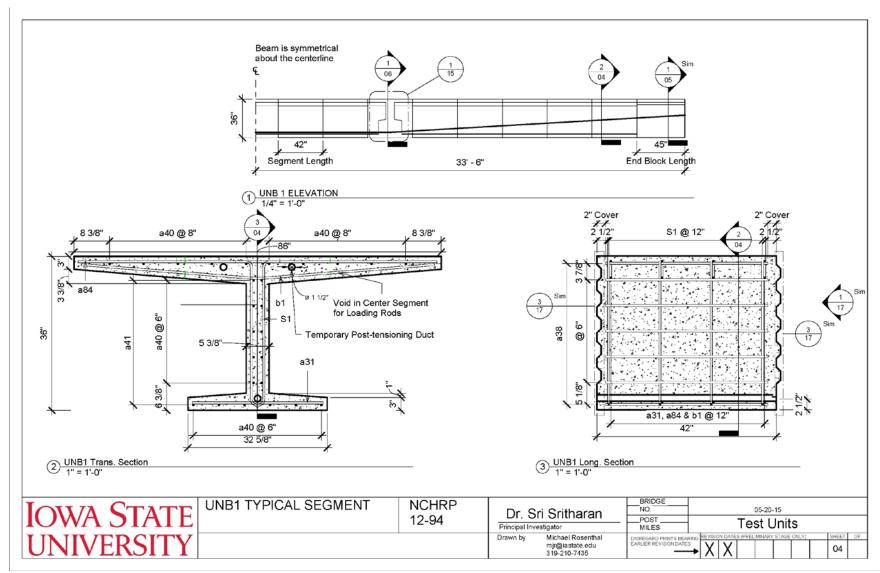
UNB1 Typical Longitudinal and Transverse Section
